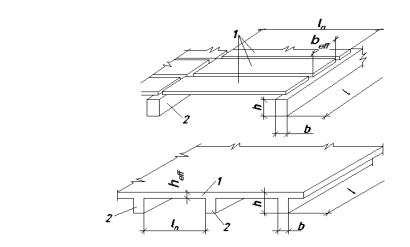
Reinforced concrete floor structures: a - precast; b - cast in place; 1 - a slab; 2 - a beam
